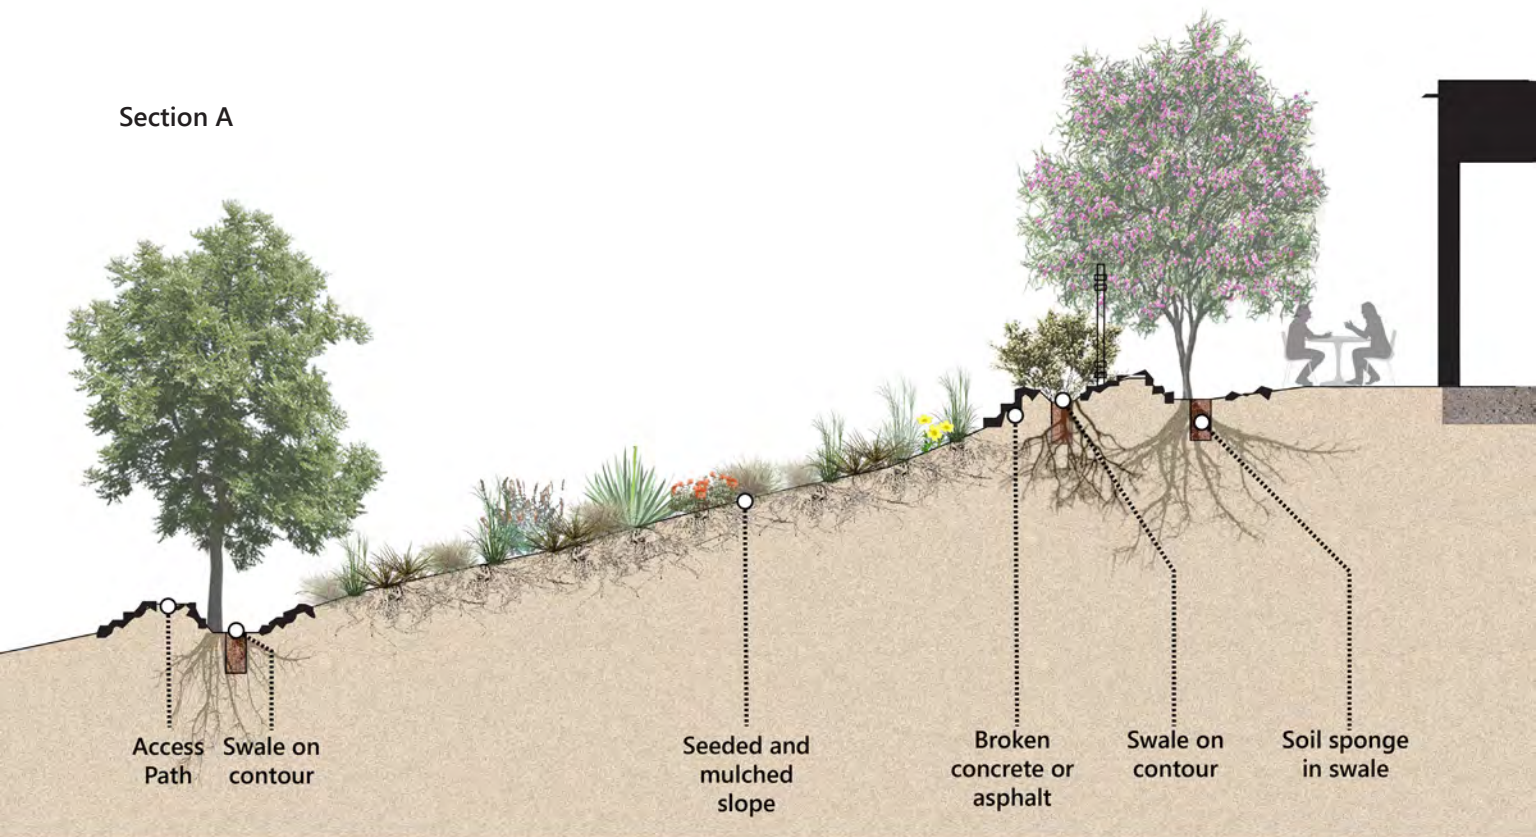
Section A Through Proposed Design for Roof Runoff and Slope (figure by author)
